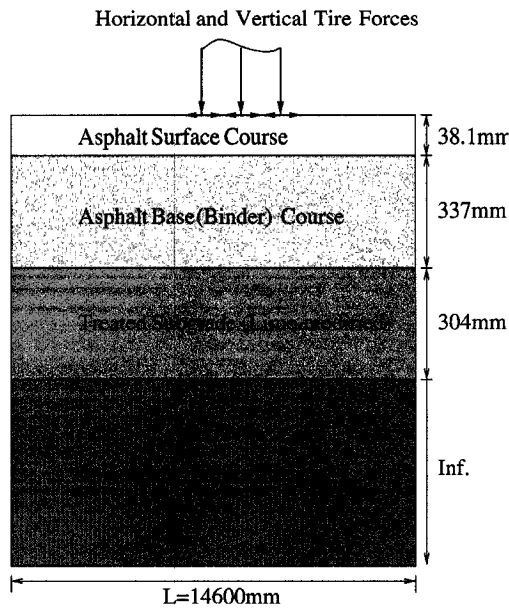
Typical pavement cross-section for Illinois I-155.
